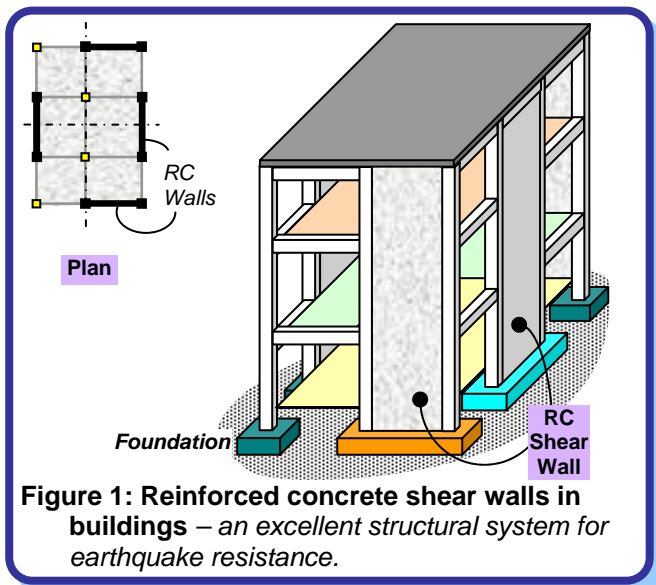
Reinforced concrete shear walls in buildings – an excellent structural system for earthquake resistance.
